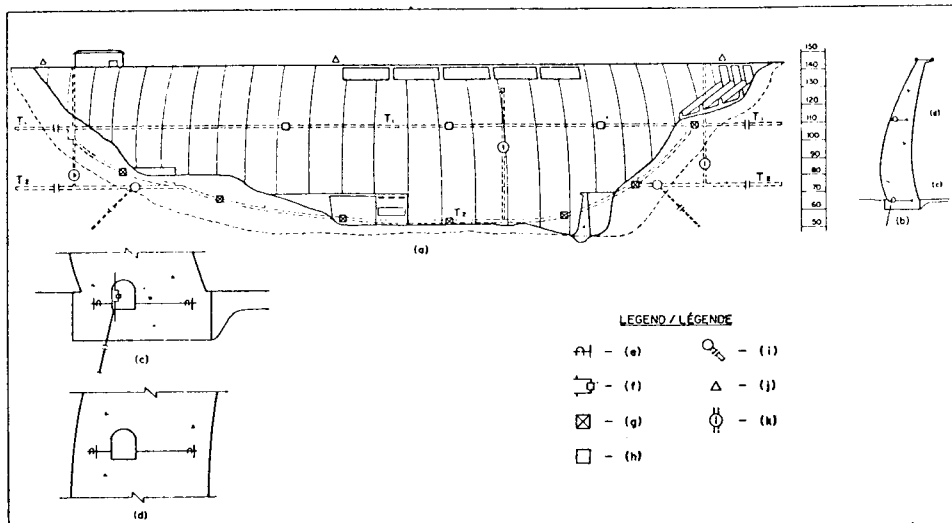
Some Details of Upgraded Instrumentation Lay-out for Pongolapoort Dam
